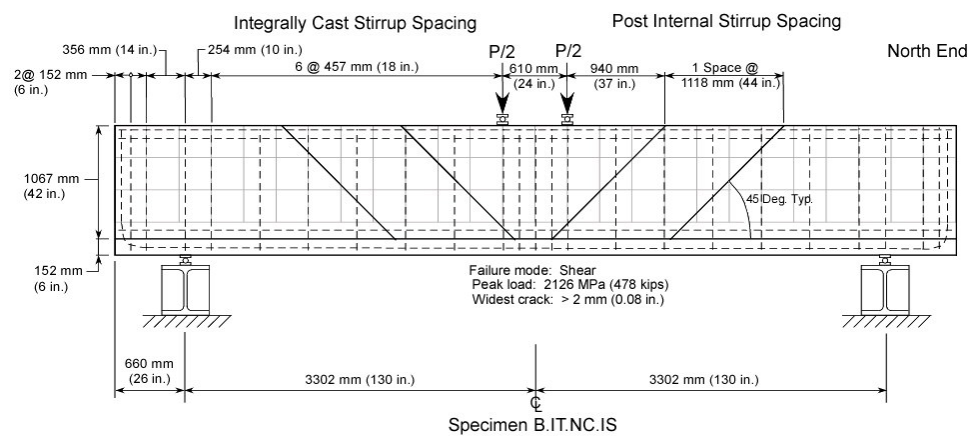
Specimen B.IT.NC.IS repair.
